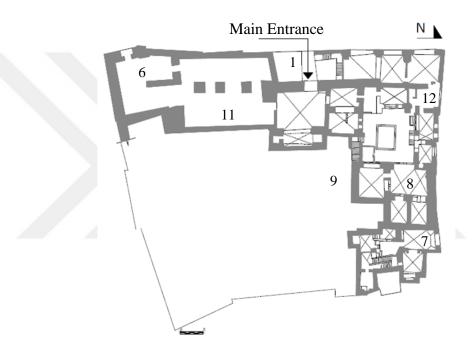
First floor plan of Abdelhadi Palace in Nablus old city (Kanaan, 2010)
